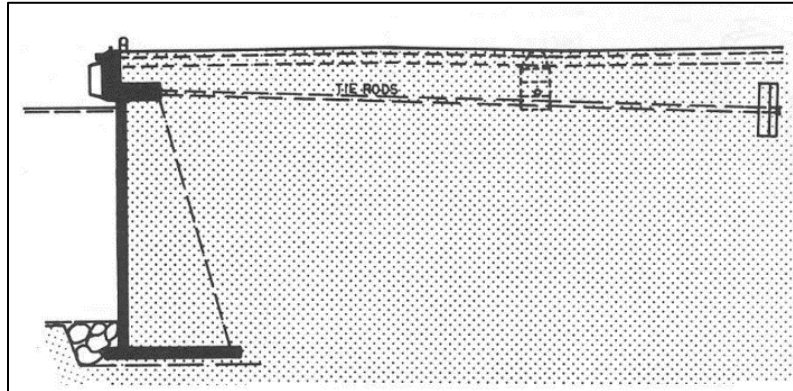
L-wall element anchored to backfill (Pitkala, 1986)
